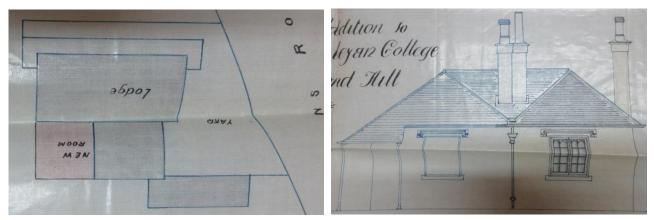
(left): Block plan of Oak Tree Lodge, 1893. Figure 27 (right): West elevation of proposed bedroom extension to Oak Tree Lodge, 1893.
